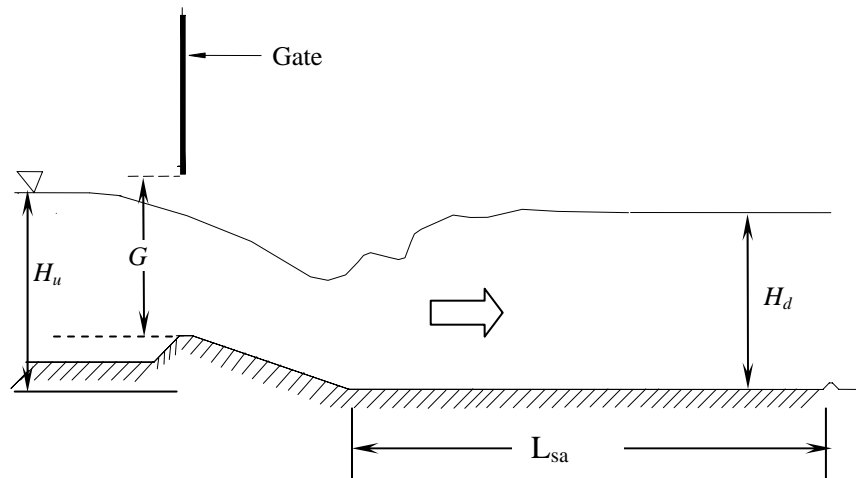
Typical longitudinal cross section of barrage bay showing the various parametrs
